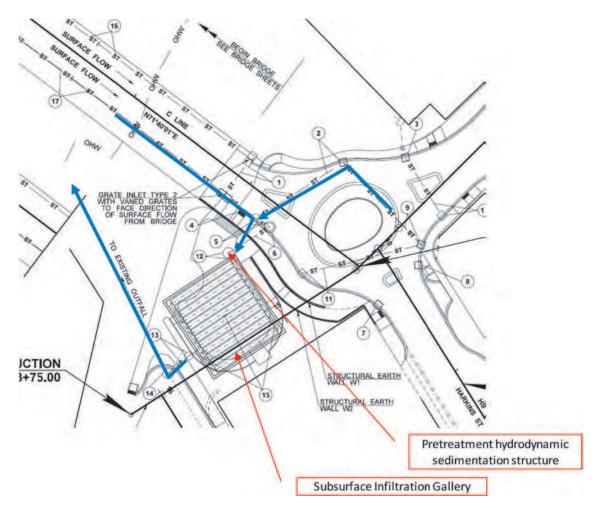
WSDOT Manette Bridge replacement, east end BMP layout.
